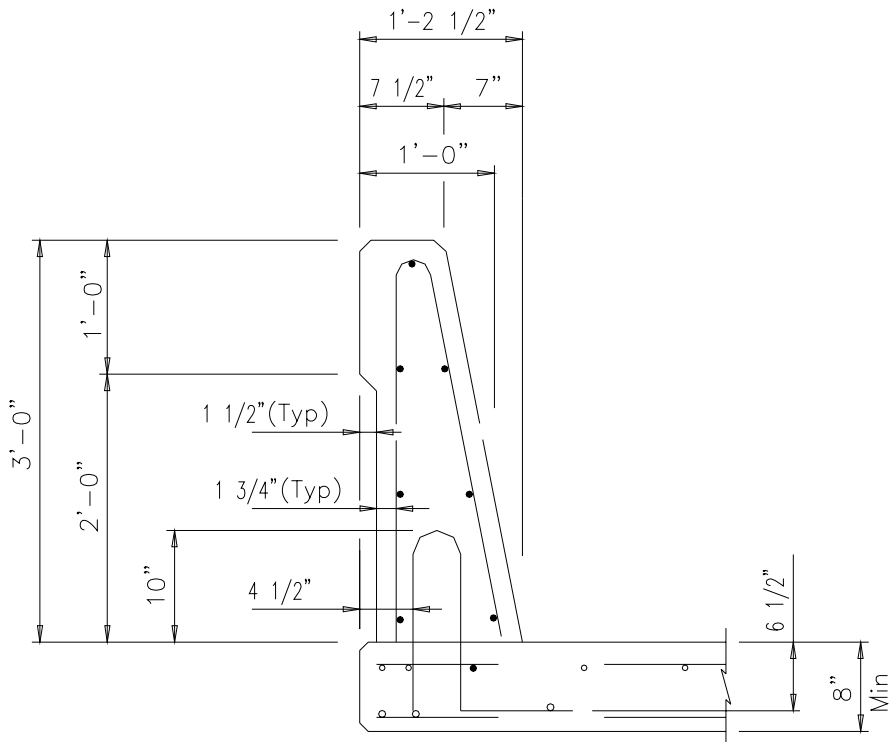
Cross Section of Single Slope Traffic Rail.
